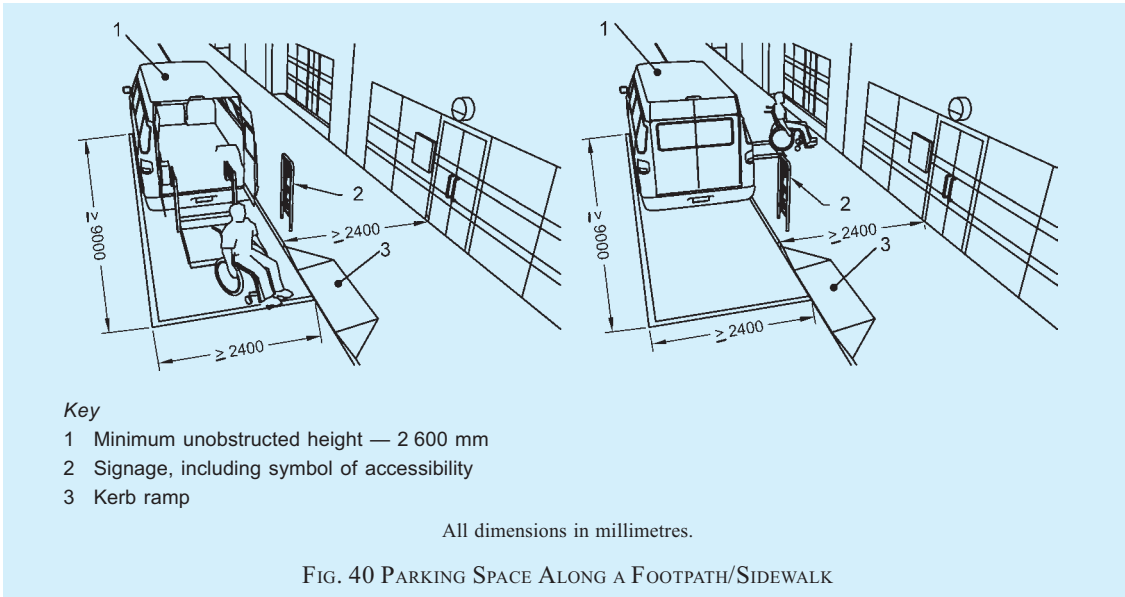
PARKING SPACE ALONG A FOOTPATH/SIDEWALK
